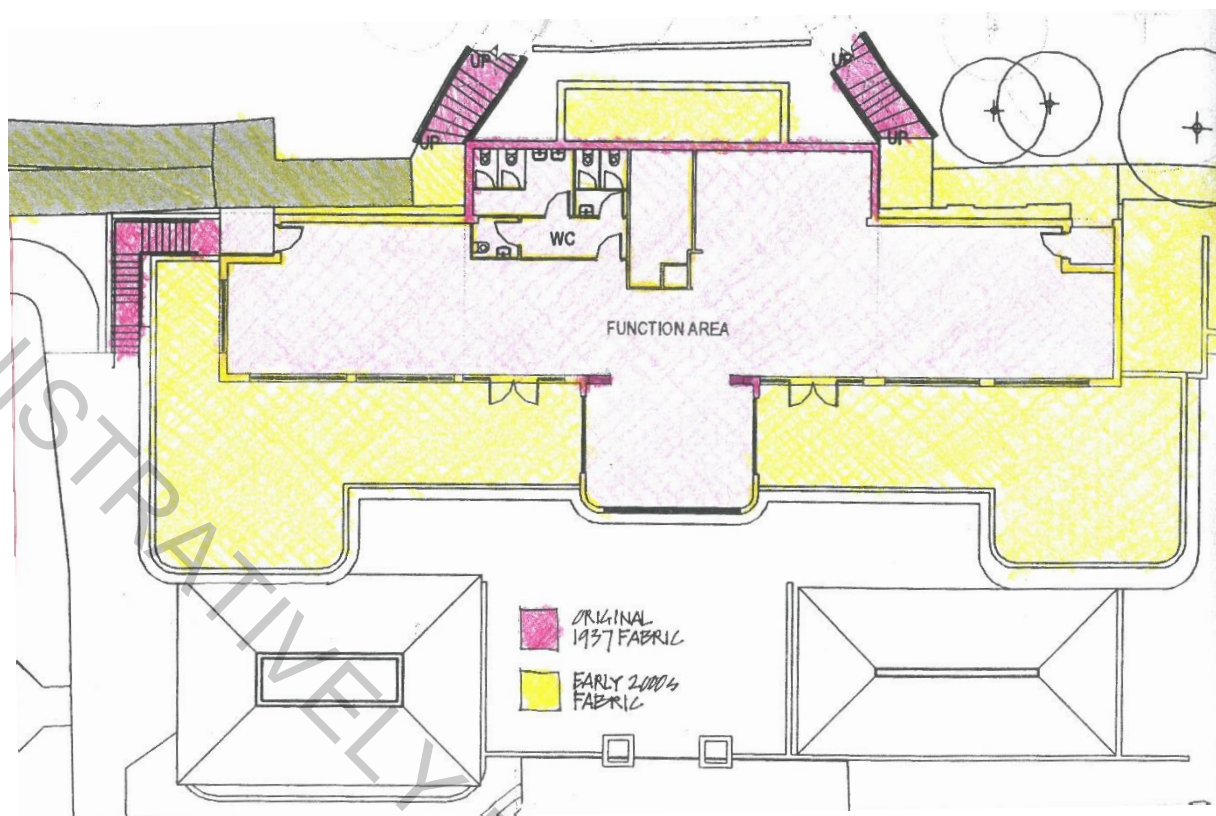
Diagrammatic ground floor plan showing extent of original fabric
